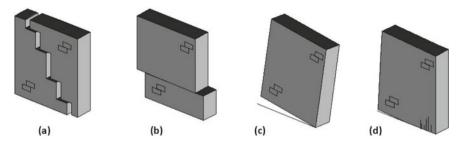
In-plane failure techniques of un-reinforced brick walls a Shear failure, b Sliding failure, c Rocking failure, d Toe-crushing failure
